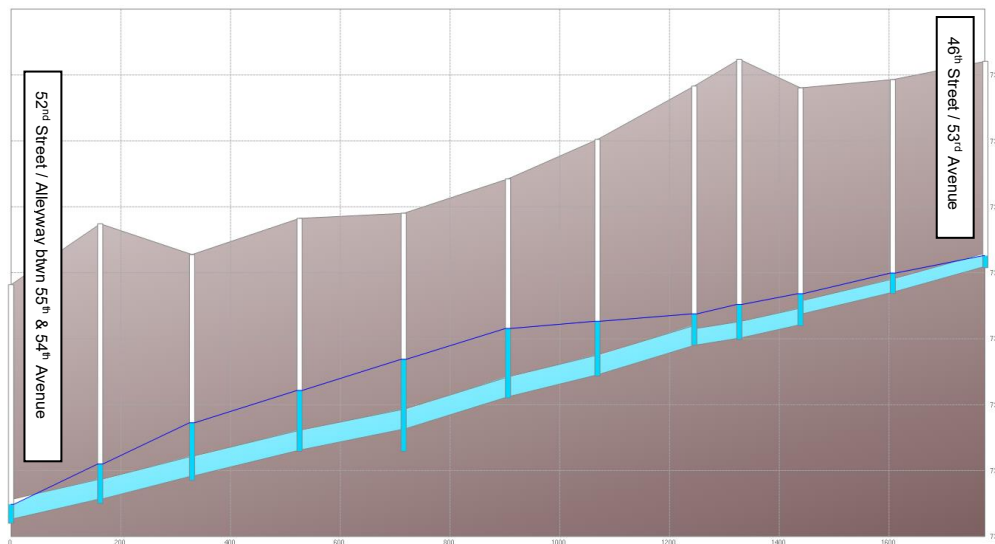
Deficiency 1: 200mm-300mm Sanitary Pipe; Following 46th Street, to Alleyway Alignment Between 54th Avenue and 55th Avenue West of 47th Street, terminating at 50th Street – 100-yr 4-hr Chicago Design Storm
